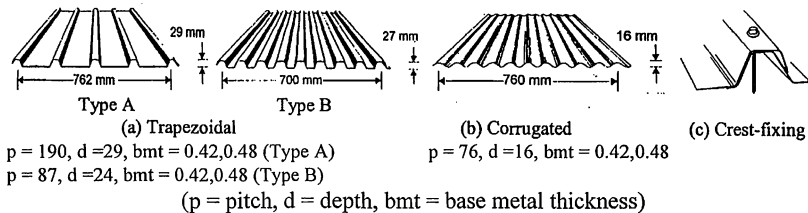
Standard Profiled Steel Cladding Systems used in Australia
